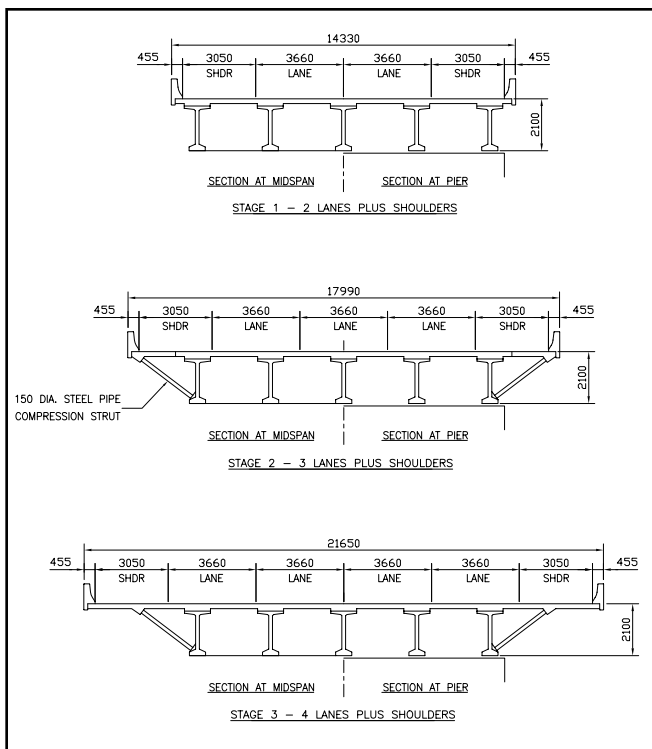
Cross section widening for an AASHTO-PCI precast girder bridge.
